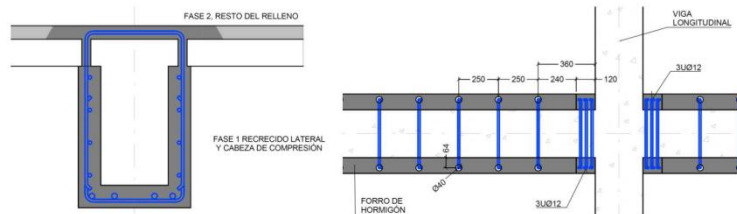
Section of the overlaid transverse beam and plan detail of the connection with the longitudinal beam
